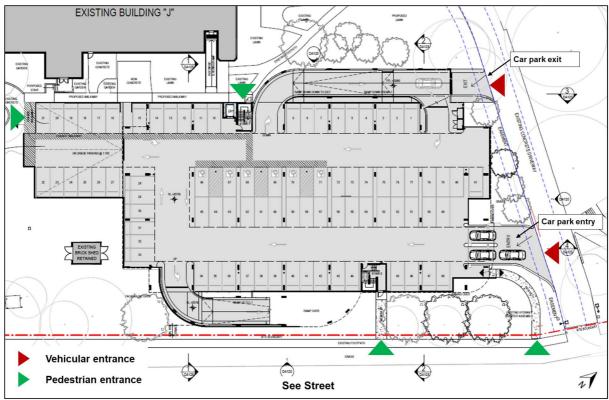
| Ground floor layout of the Southern Site car park (Source: Applicant's Amended Car Park plans submitted on 14 August 2020)
